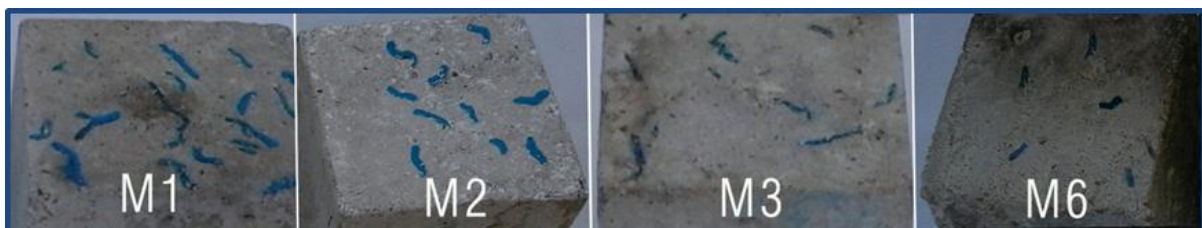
Surfaces texture of test specimens after fire exposure at 800 °C
